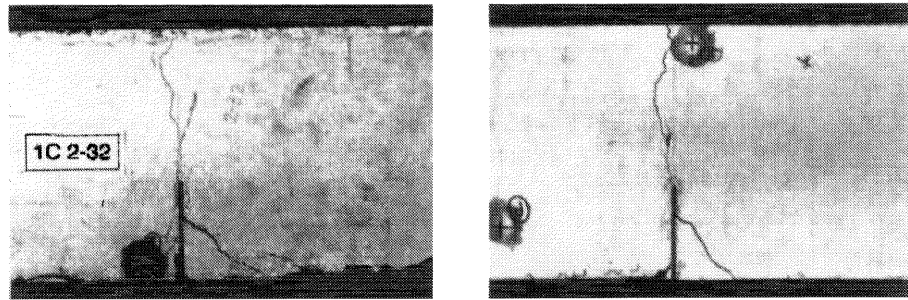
Photographs of failed specimen with reinforced CFRP sheet (left) and GFRP sheet (right)
